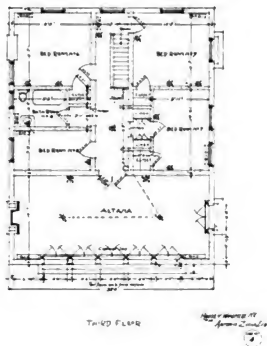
THIRD FLOOR PLAN SHOWING "ALTANA."
